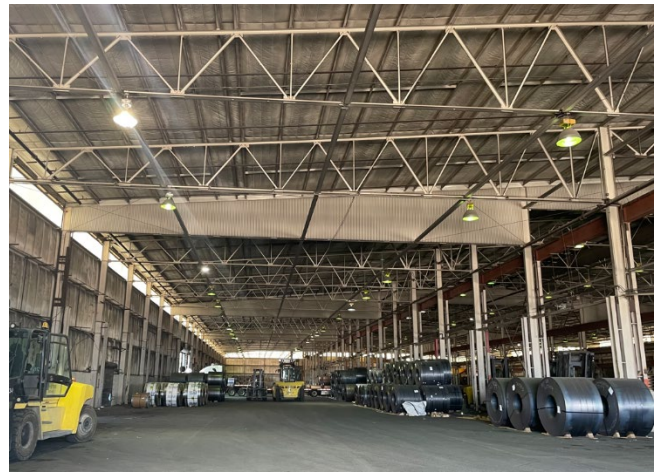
View to the south on east half of Warehouse A, showing two rows of HID high bay lighting
